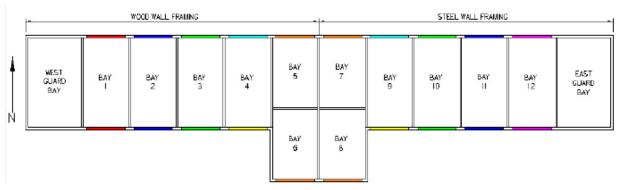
Floorplan of the CRRF. Central bays not used; two test walls on each exposure of each bay.
